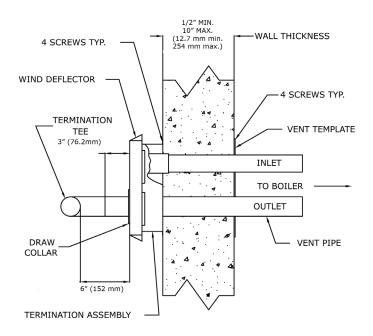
Top View Of Termination Kit And Wall (For Combustible Wall Installation)
